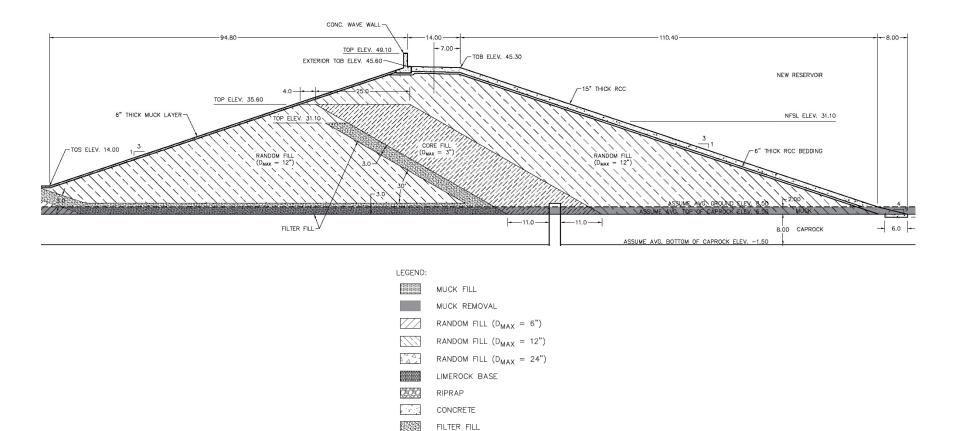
Typical Cross Section for the A-2 Reservoir
